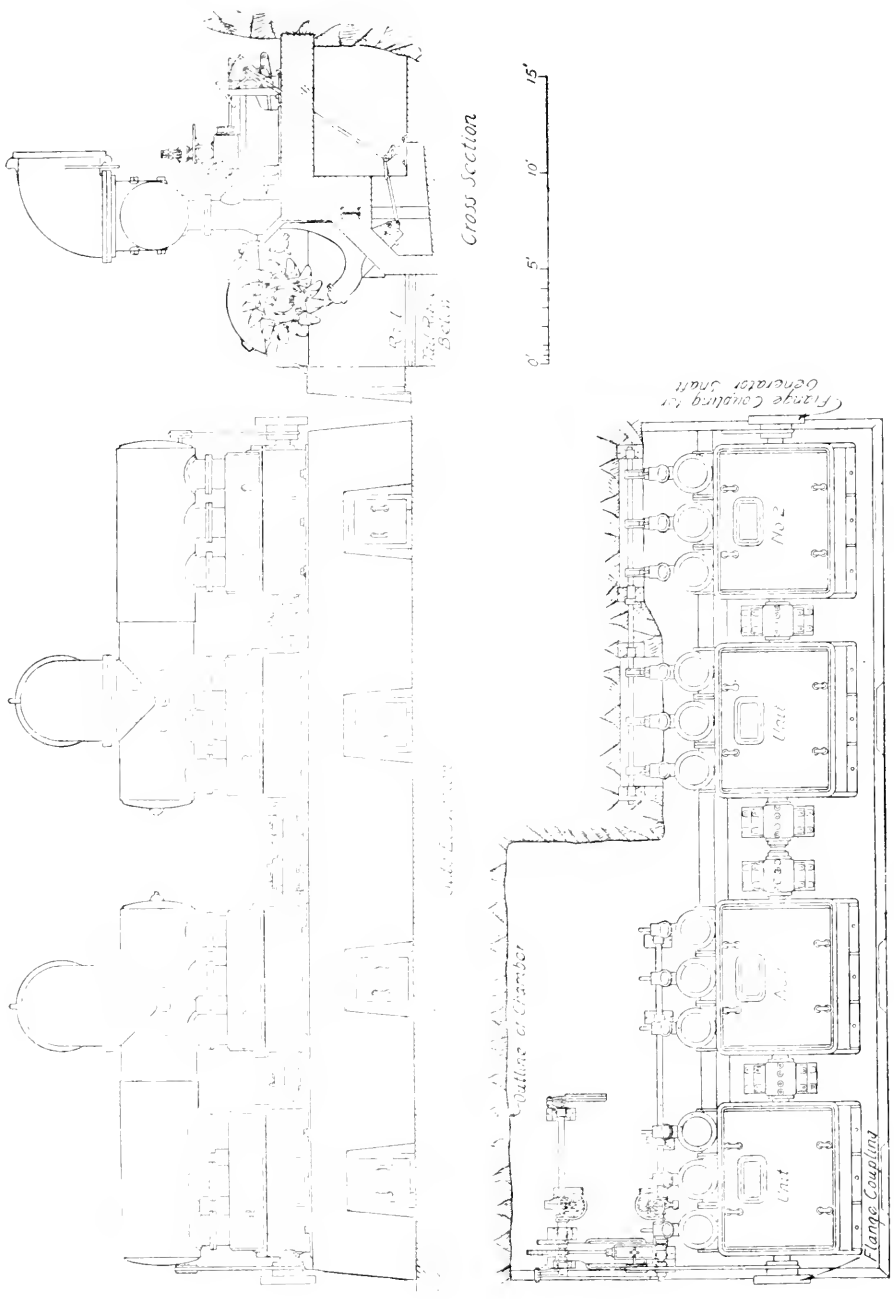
A. Elevation, Plan, and Section of Water Motors in Plant of the Snoqualmie Falls Power Company, Washington.
